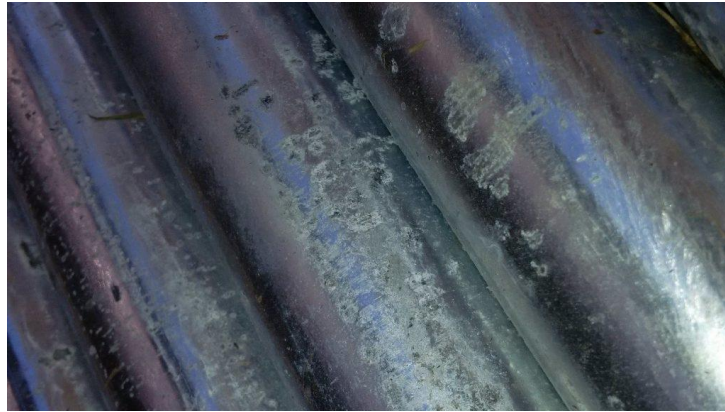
Corrosion of Hot-dipped galvanized steel
